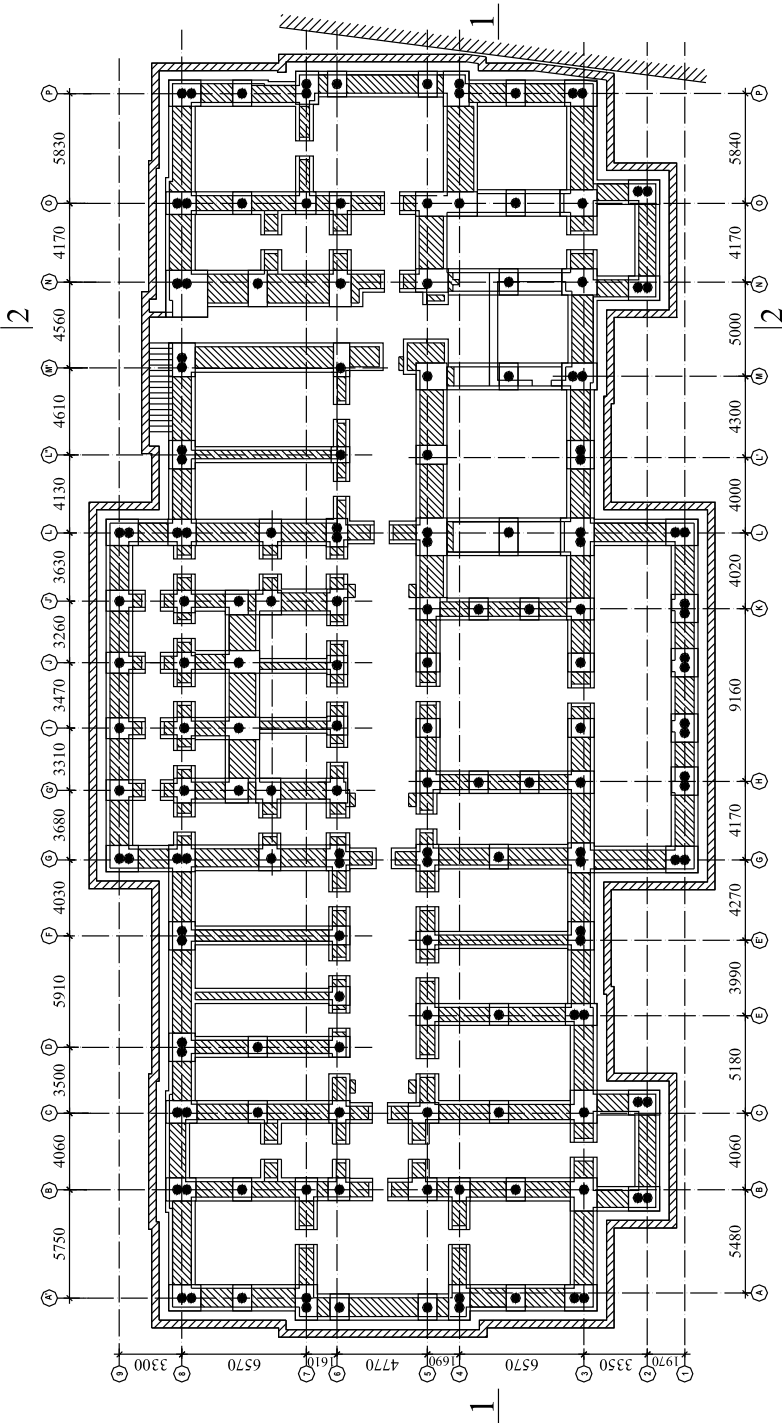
Plan of location of seismic isolators on the level of the newly created basement highlighting the lower pedestals under the isolators and the lower continuous beams along the whole perimeter of the bearing walls
